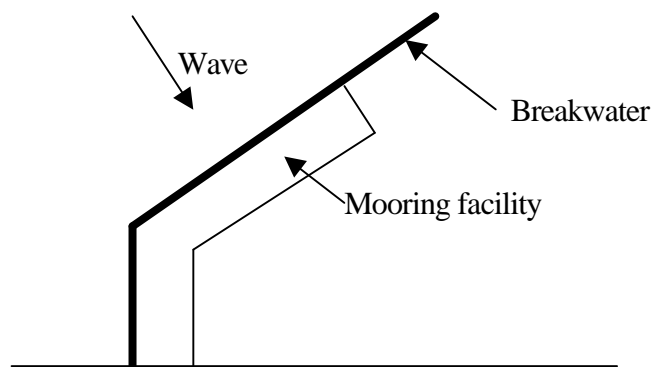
Mooring Facility Incorporated with Breakwater
